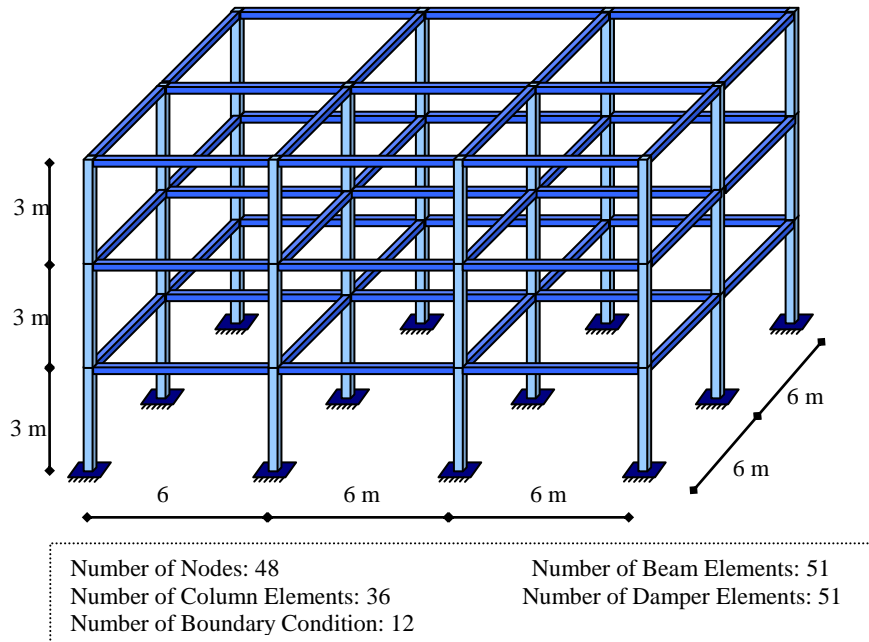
Geometry of the 3D three-story reinforced concrete frame structure
